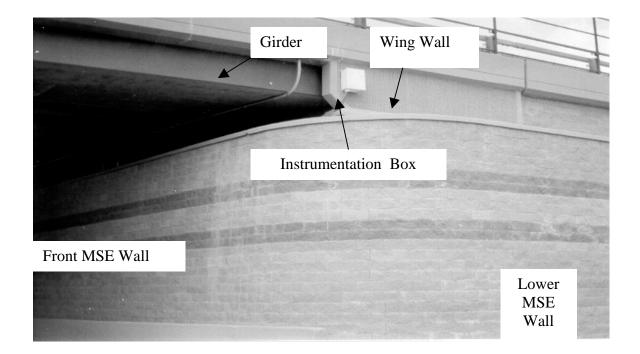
View of the south-east side of the completed Founders/Meadows Bridge.
